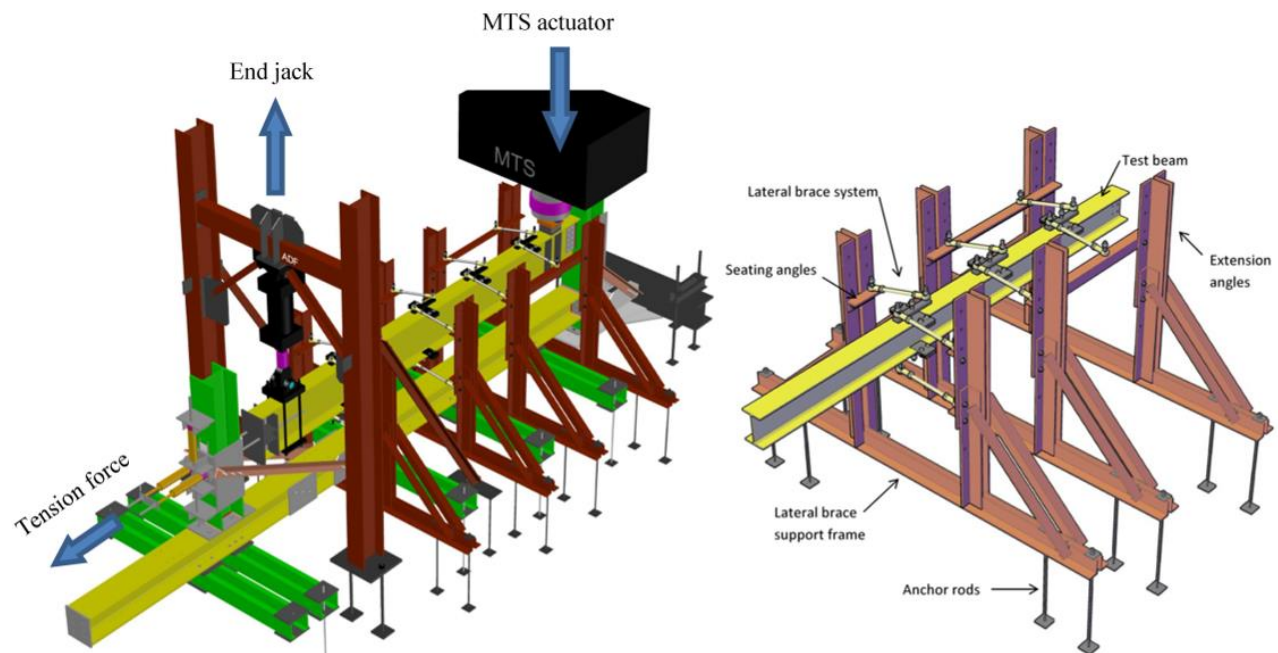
Full test setup for the W610 combined vertical and tension force shear tab test, with details of lateral bracing system and support frame
